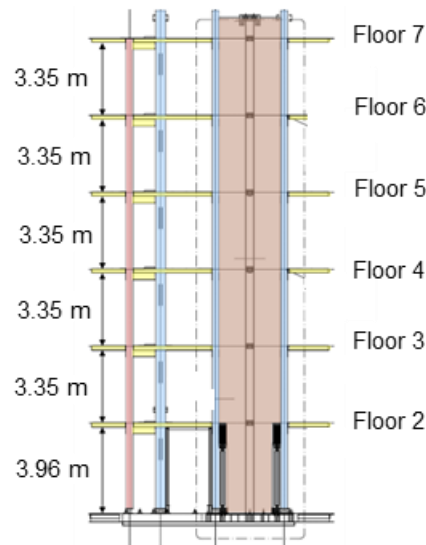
Elevation view of Post-Tensioned Rocking Mass Timber Walls with BRBs boundary elements.
